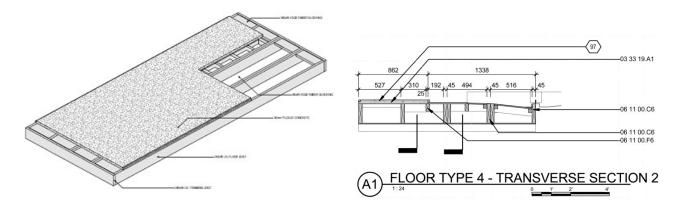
Isometric and section of M4 floor construction, showing double joists where concrete has been removed
